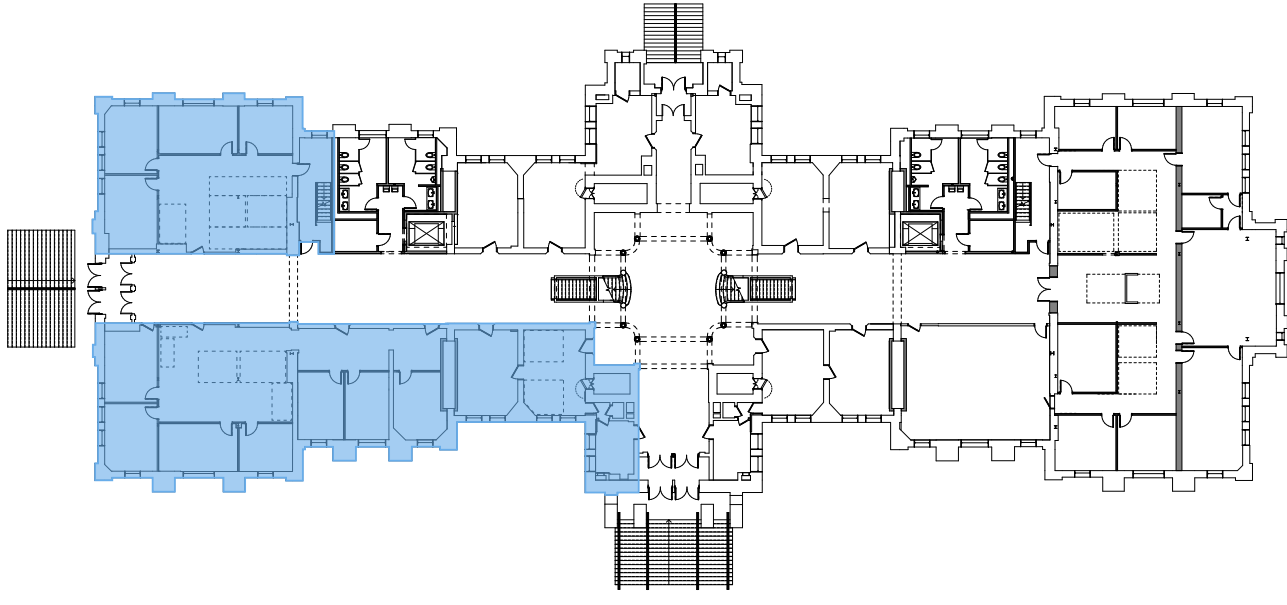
Proposed Space Allocation: Legislature and LSO - First Floor [Capitol]
